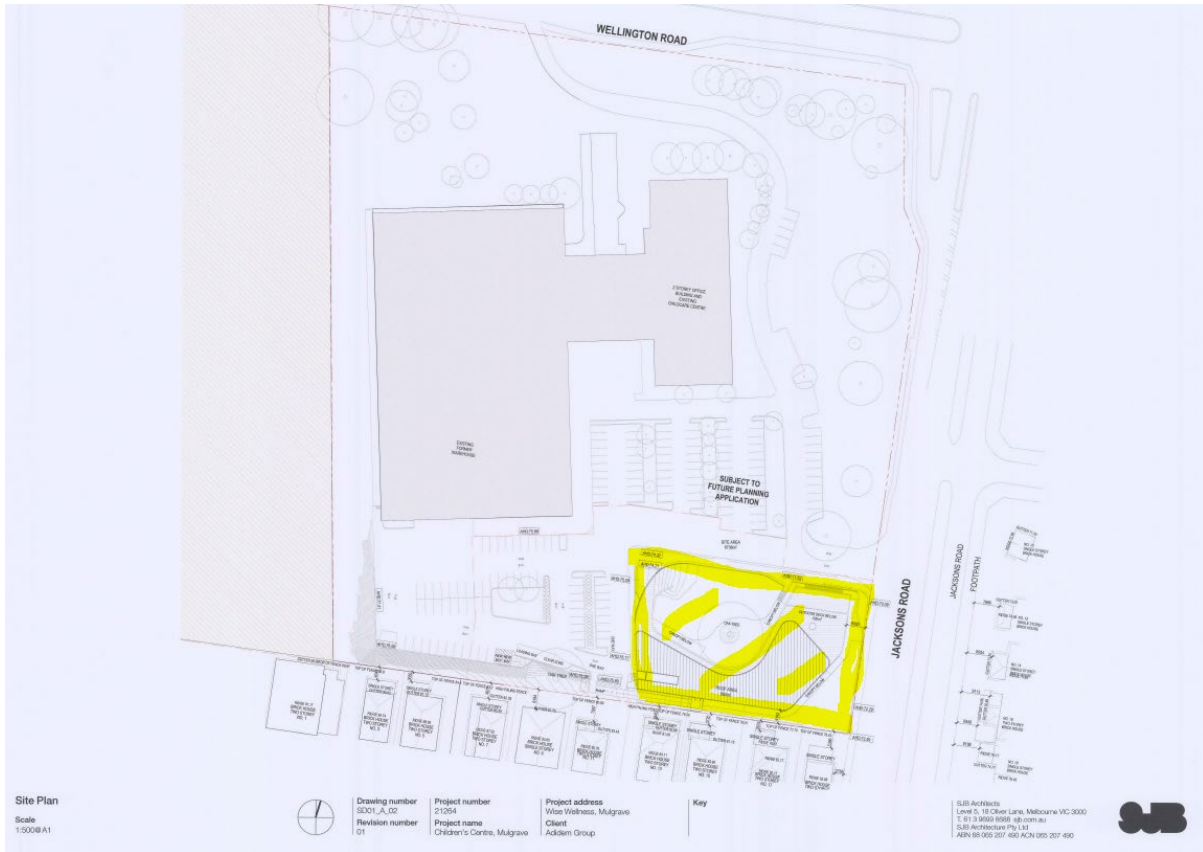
TPA 48276. Location of childcare centre shown in south eastern corner of 1 Jacksons Road.
